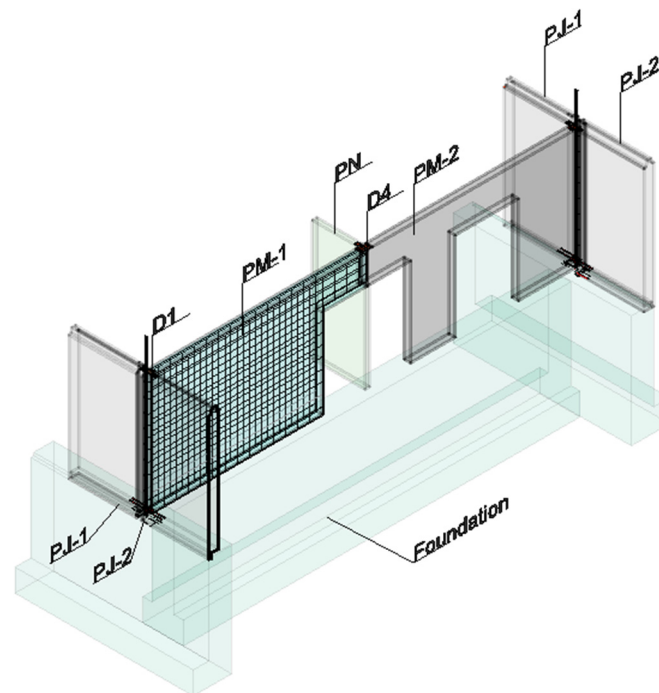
A 3D view of wall panels PM-1 and PM-2, showing the reinforcement detailing, panel connections, and foundation interface.
